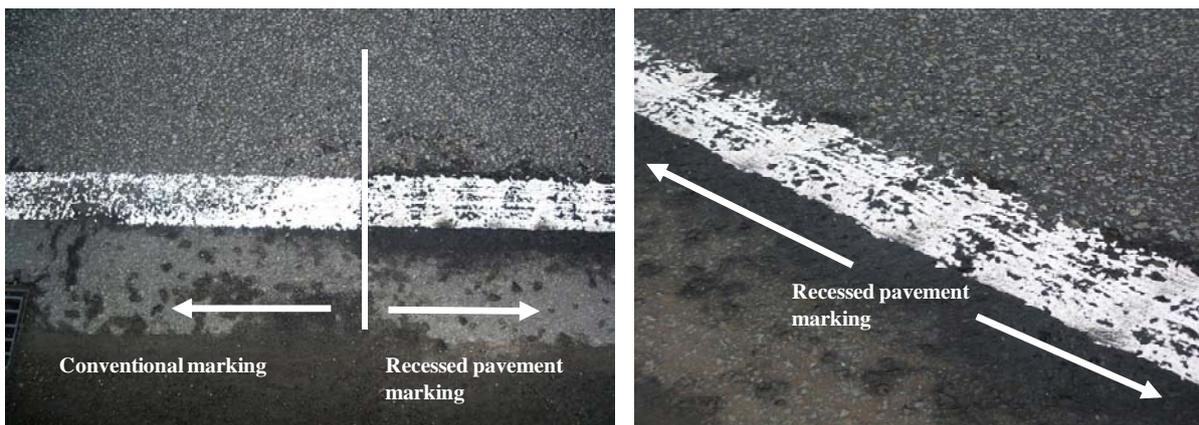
Conventional and recessed pavement markings (Rte. 230, 04/13/06)
